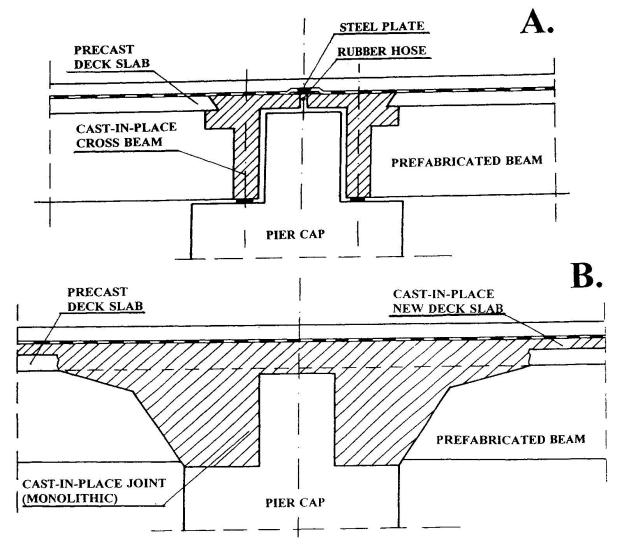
Modernization of the supporting area of piers: a) before reconstruction; b) after reconstruction. Curbless cross-section was replaced by new one with curbs separating pedestrian lanes from those for the traffic. Total structure and service width does not change. Sidewalk was designed as reinforced concrete put-on slab separated from the carriageway by stone curbs. All hollows, pipes and empty chambers were removed.
